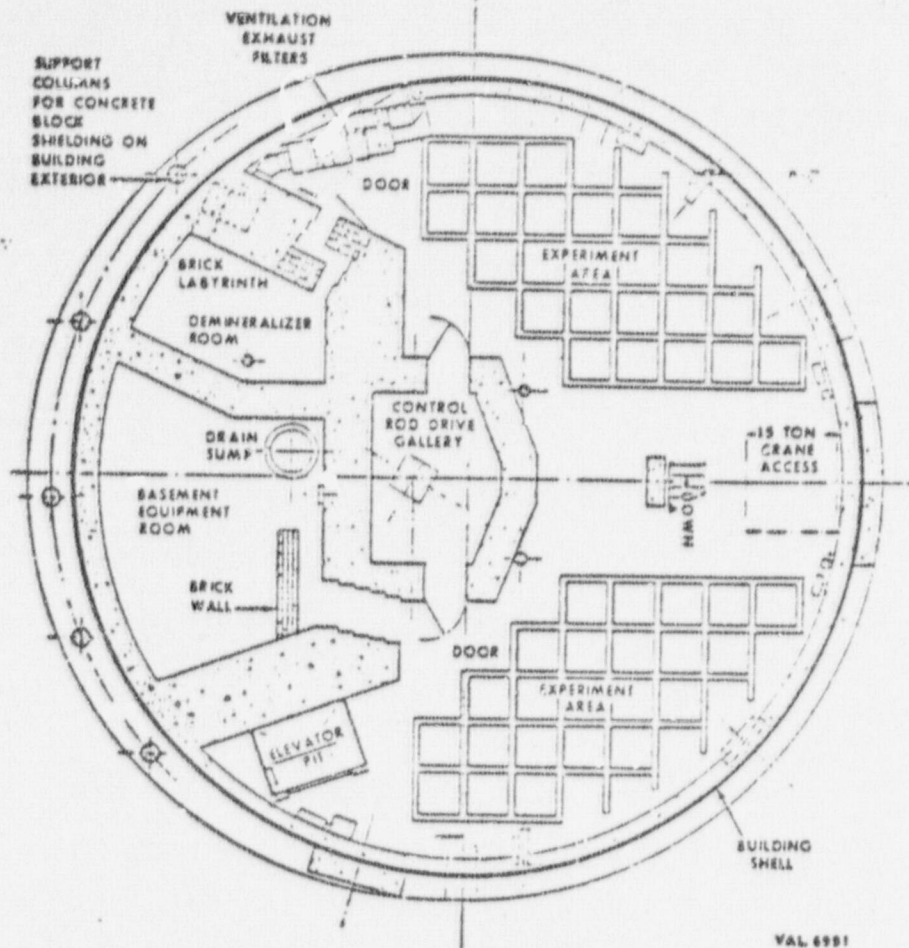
REACTOR BUILDING BASEMENT PLAN
